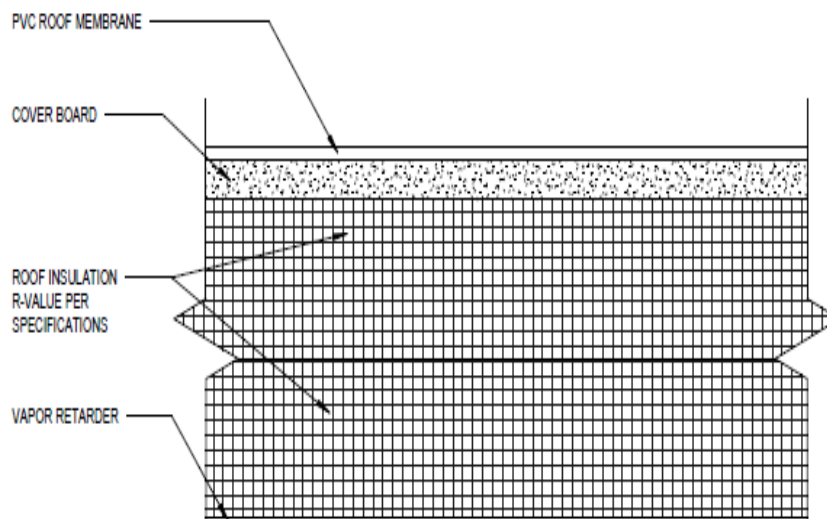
| Typical Concrete Roof Section (SmithGroupJJR)
